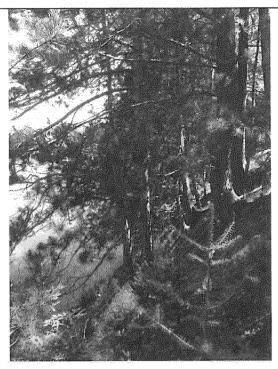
Photo looking the Michigan shoreline at near the south end of the proposed cut-off wall location (Golder, 2016)
